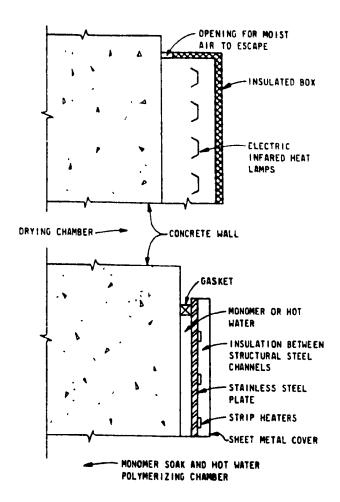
TYPICAL SECTION SHOWING THE ENCLOSURES FOR DRYING, SOAKING, AND POLYMERIZING THE OUTLET WALLS AT DWORSHAK DAM<sup>55</sup>
